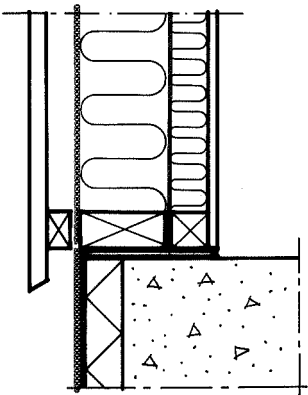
Example of a joint between a wooden wall and a concrete slab. In this case, where the wall has an external mineral wool slab, the latter is allowed to extend over the skirting. This reduces the thermal bridge at the skirting.
